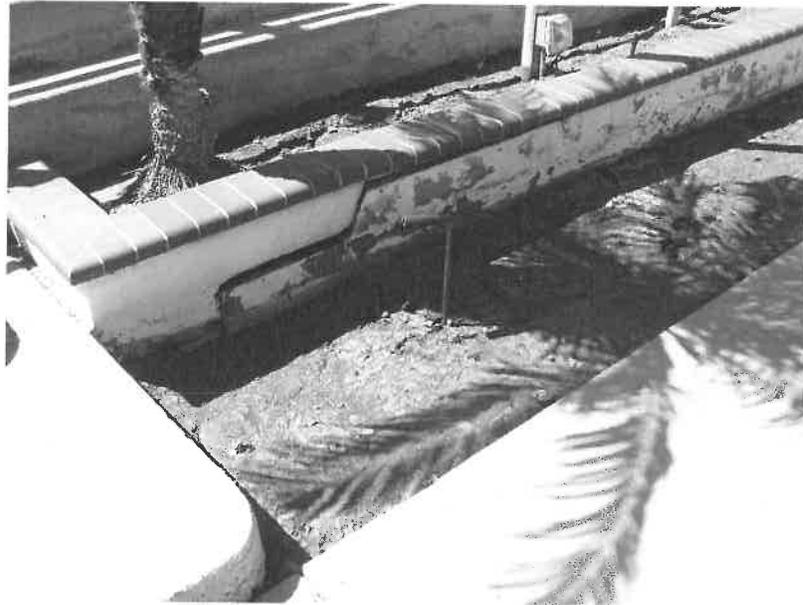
3, Naples, Top Deck Survey: Rivo Alto Canal, #24
